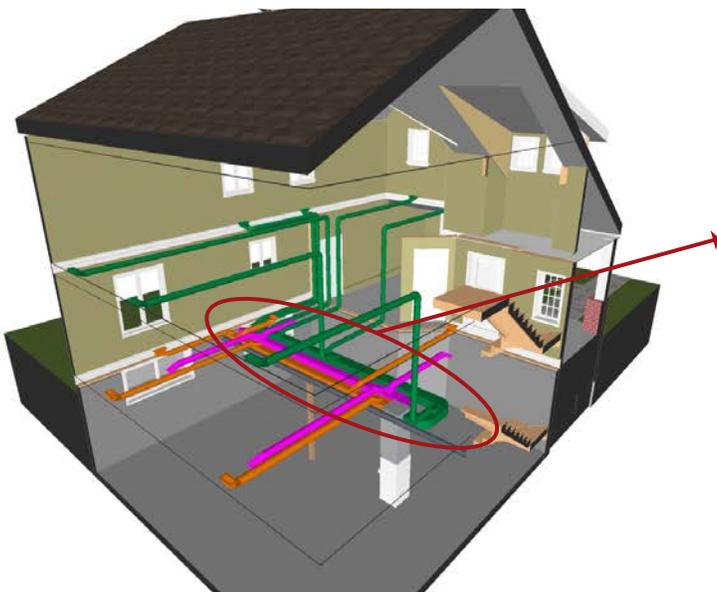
Supply Ducts for Basement, Main Floor and Second Floor Zones
